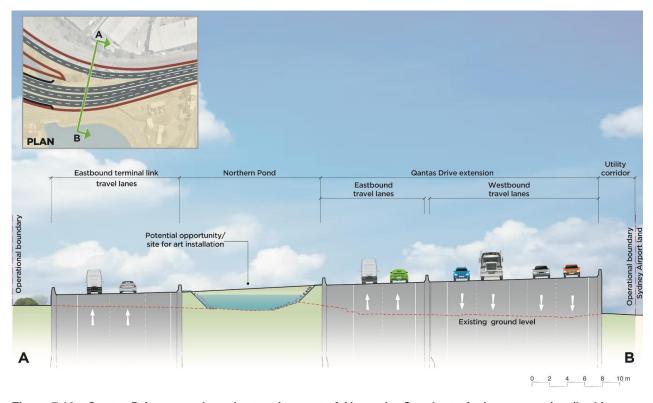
Qantas Drive upgrade and extension east of Alexandra Canal – typical cross-section (looking south)
